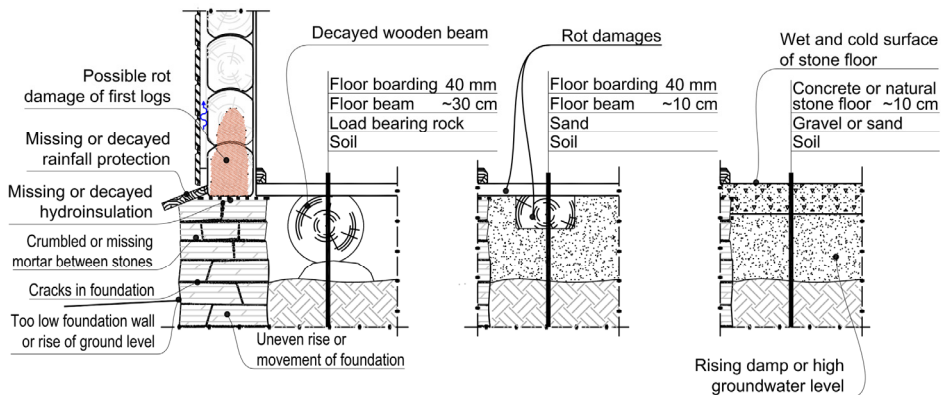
Section of a foundation, base floor and external wall. Main construction elements and common damage.
